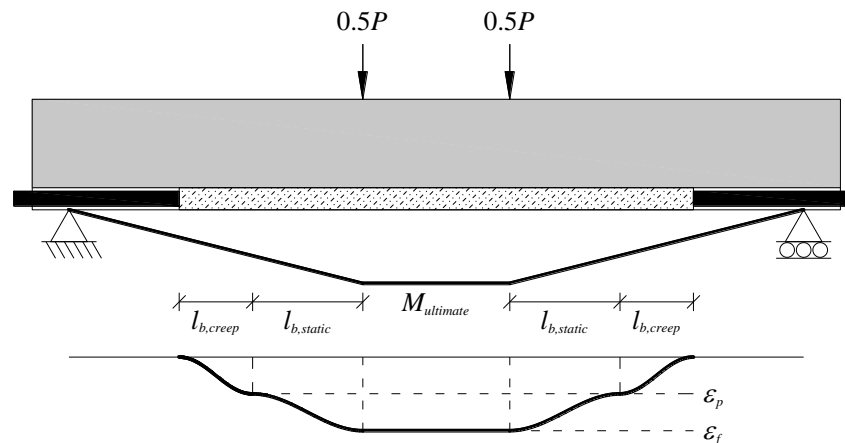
Suggestion of constructive disposition for prestressed NSM-FRP reinforced beams.
